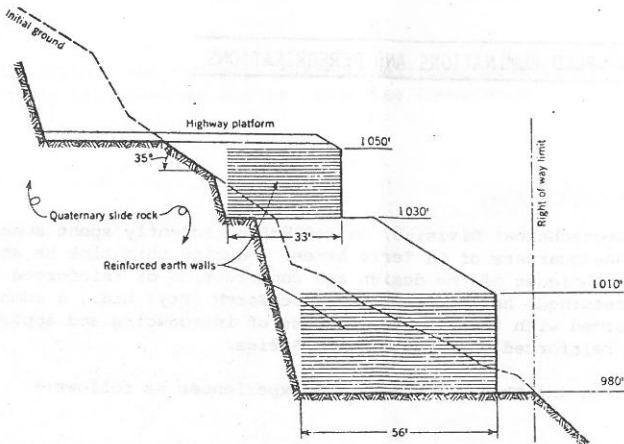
Typical section, Vigna works, French-Italian Highway. Elevations are from sea level. Together, the two reinforced earth structures are 50 ft high. Cut slope beside the highway platform can be left quite steep.
